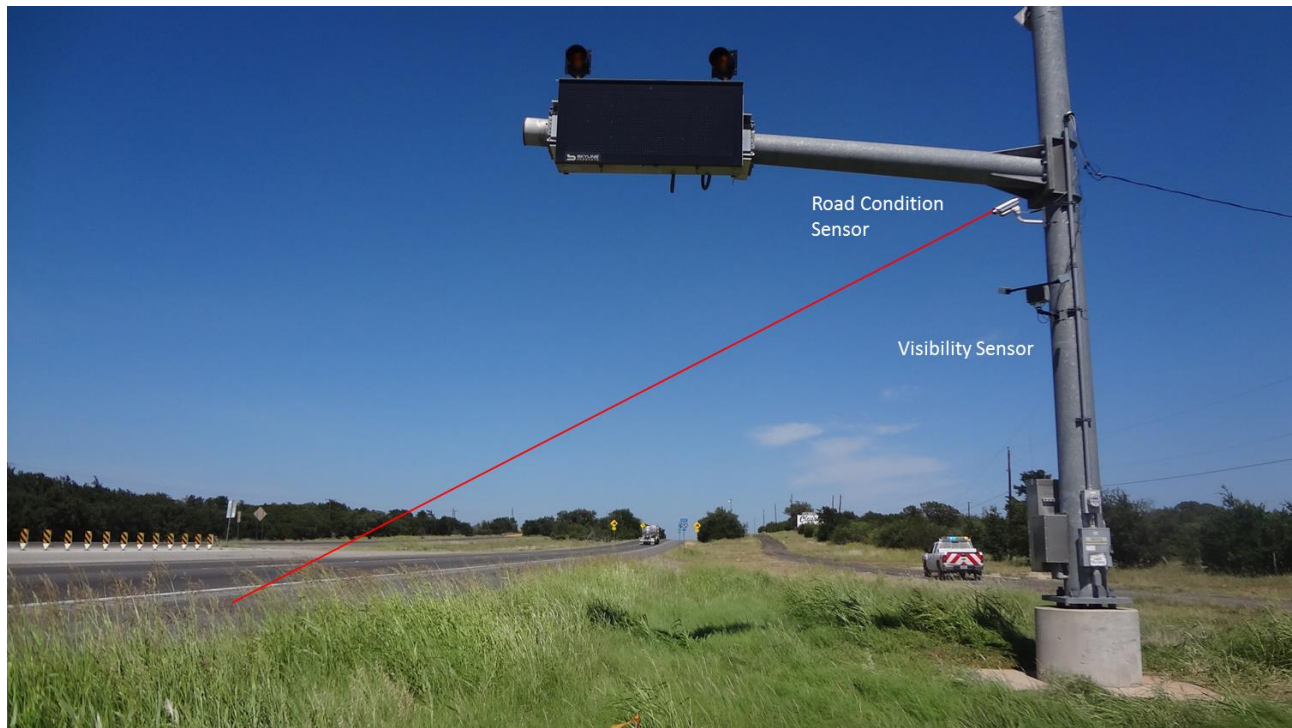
Trailer Equipment Installation, Photo 2.
